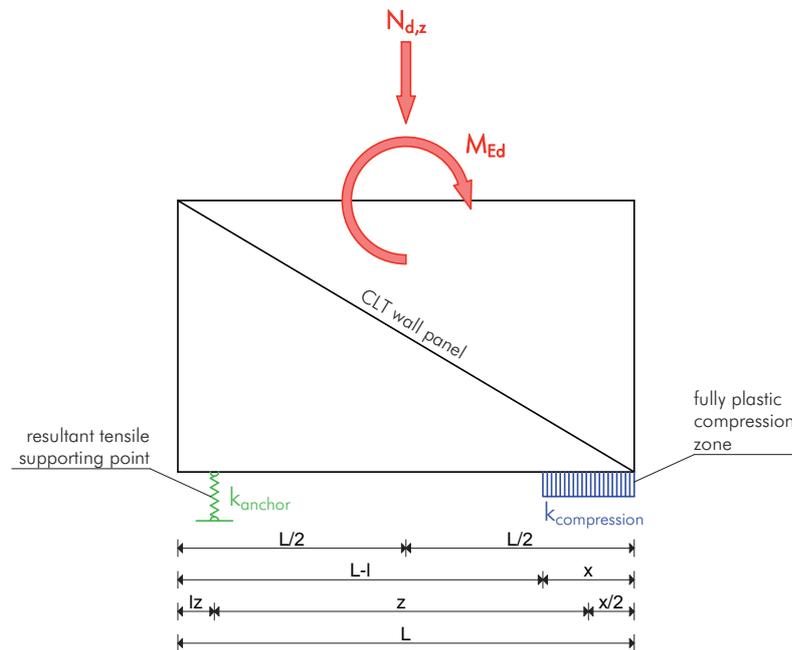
model of a load-bearing wall being exposed to bending- and longitudinal force
